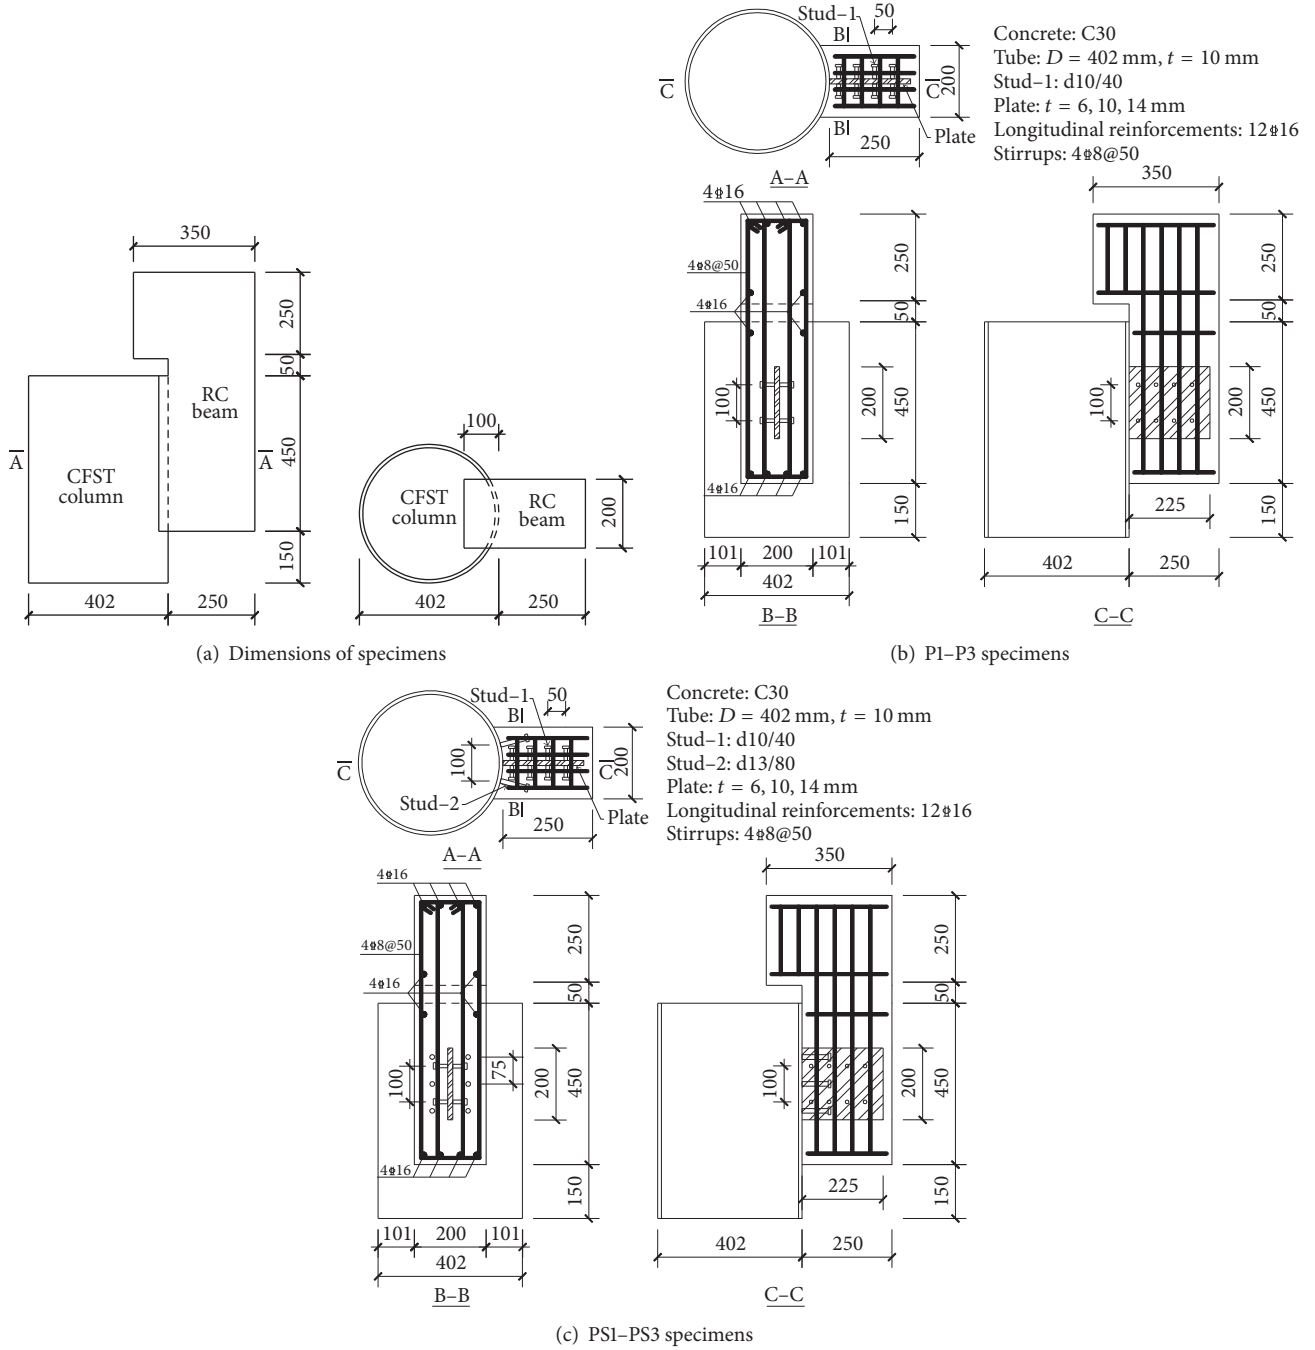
Details of the test specimens (all dimensions are in mm).
